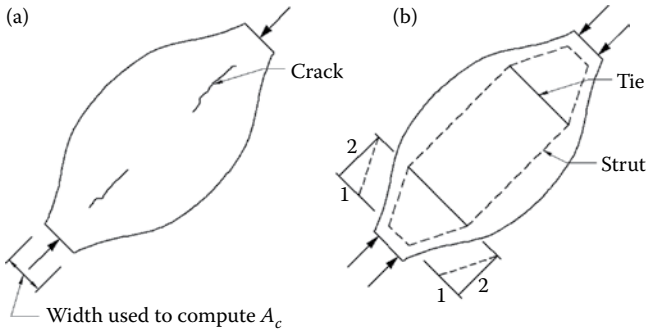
Bottle-shaped strut: (a) cracking of a strut and (b) *STM* for transverse reinforcement.
